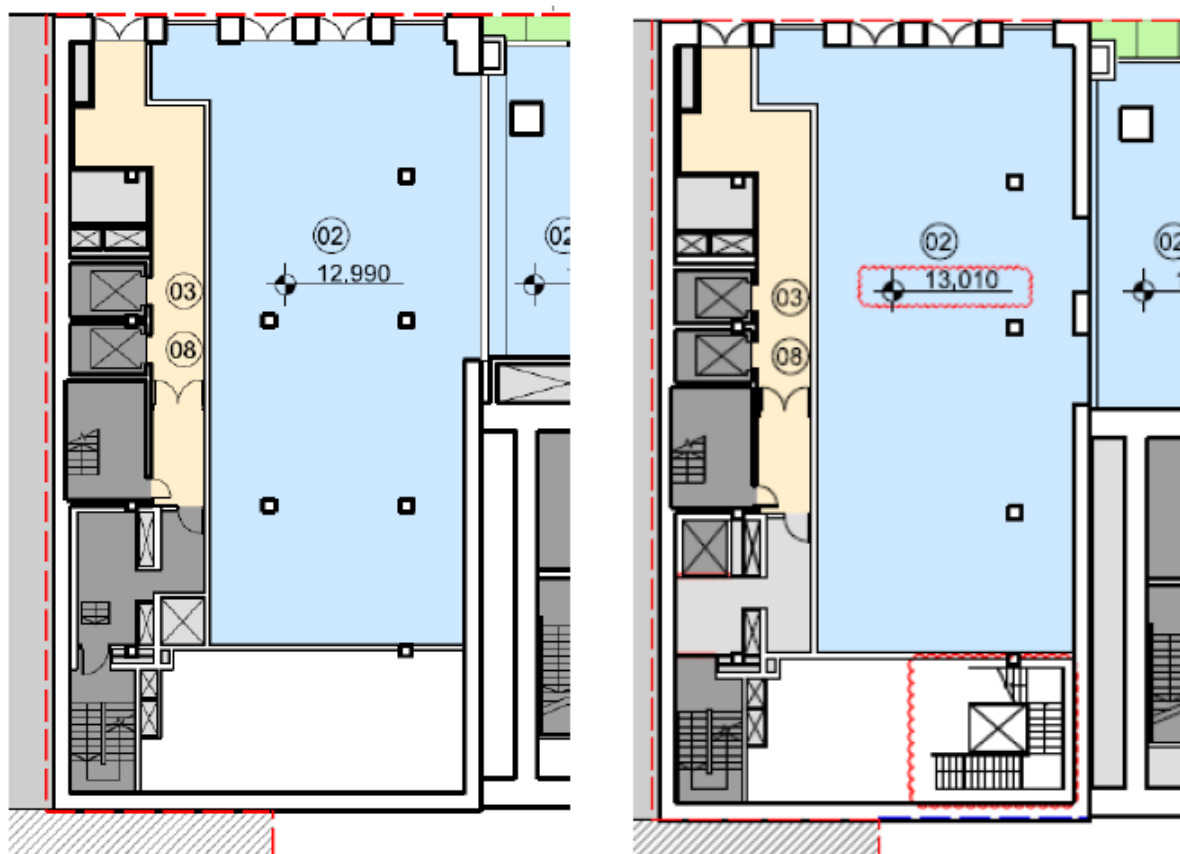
| Approved George Street level (left) and proposed new DDA lift and stairs and relocation of goods Lift (right) (Source: Applicant's Modification Report)
